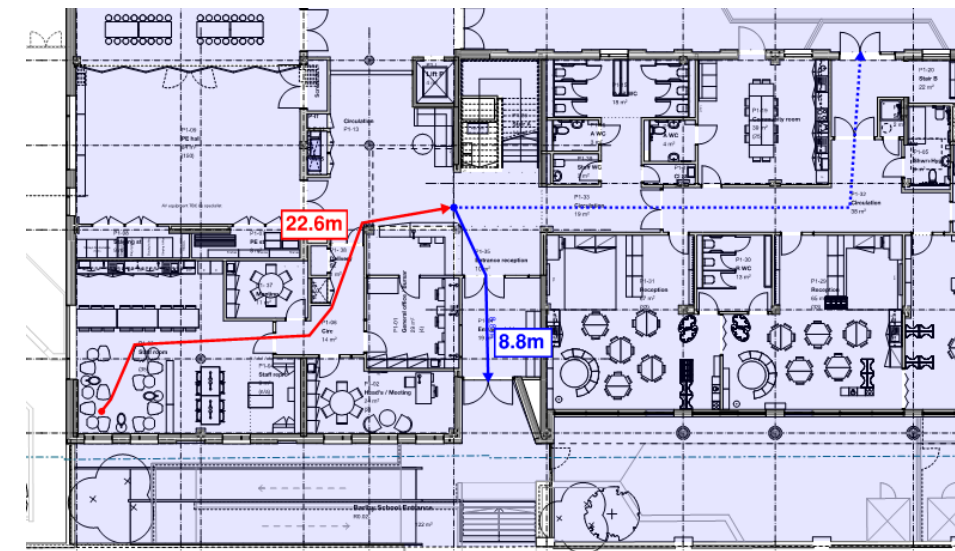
Travel distance arrangements for the Ground Floor staff room.
